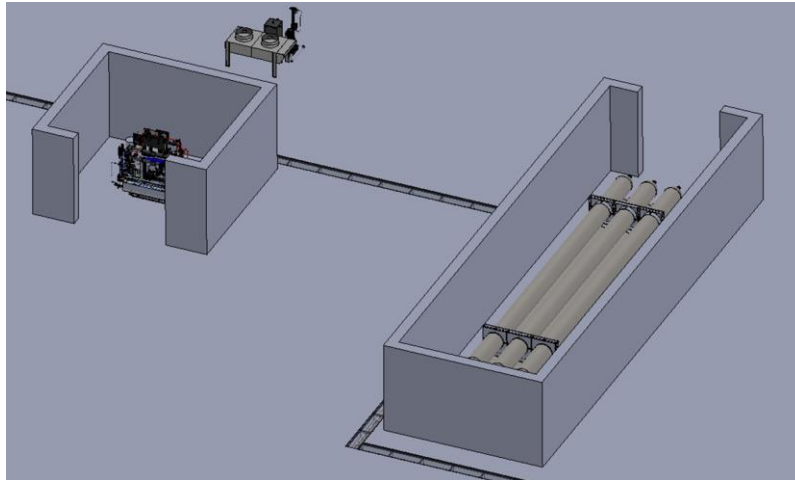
3D CAD View of the bunkers housing the hydrogen compressor and storage cylinders
